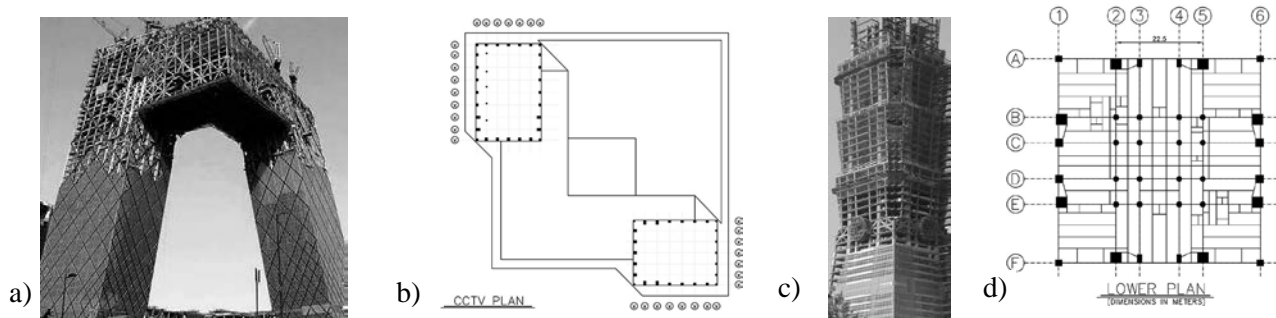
CCTV Building: a) Lateral view; b) Floor plan 1st level; and Taipei 101 c) Lateral view; d) Floor plan.
